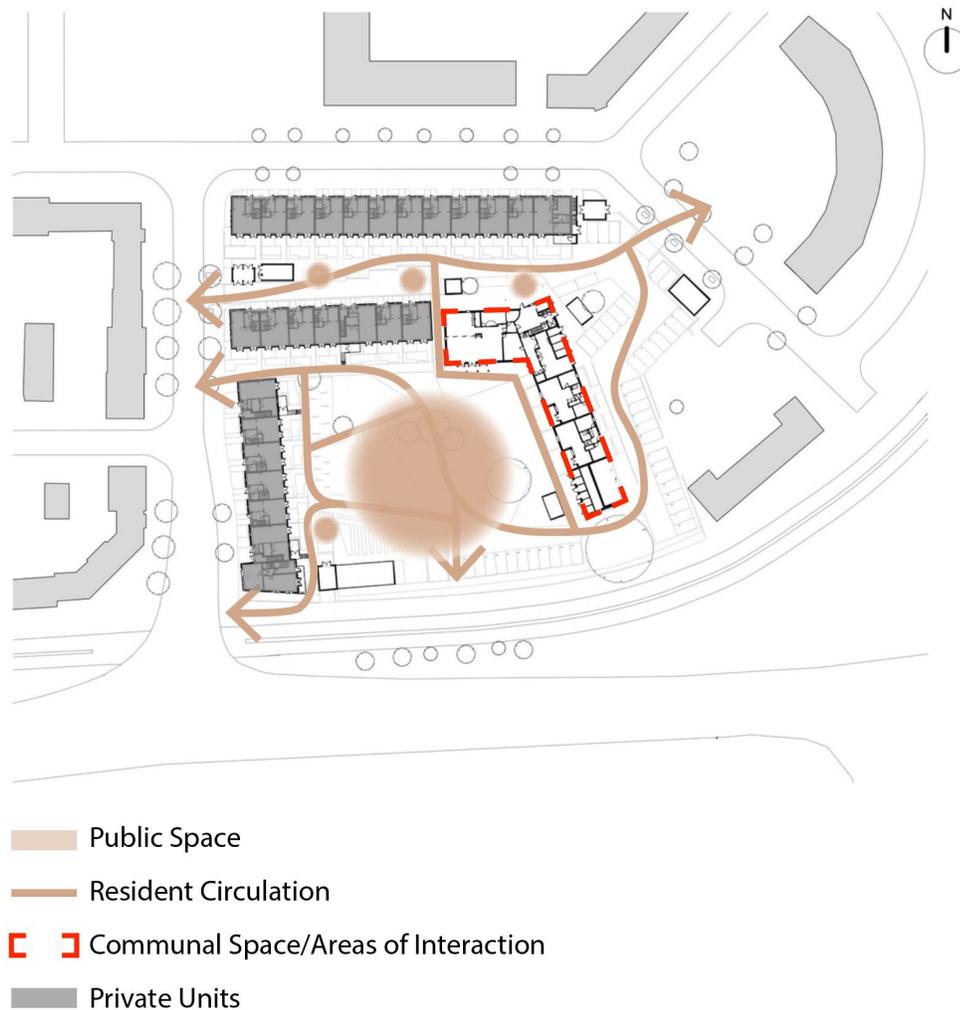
Marmalade Lane Site Plan (Source: ArchDaily & Author)
